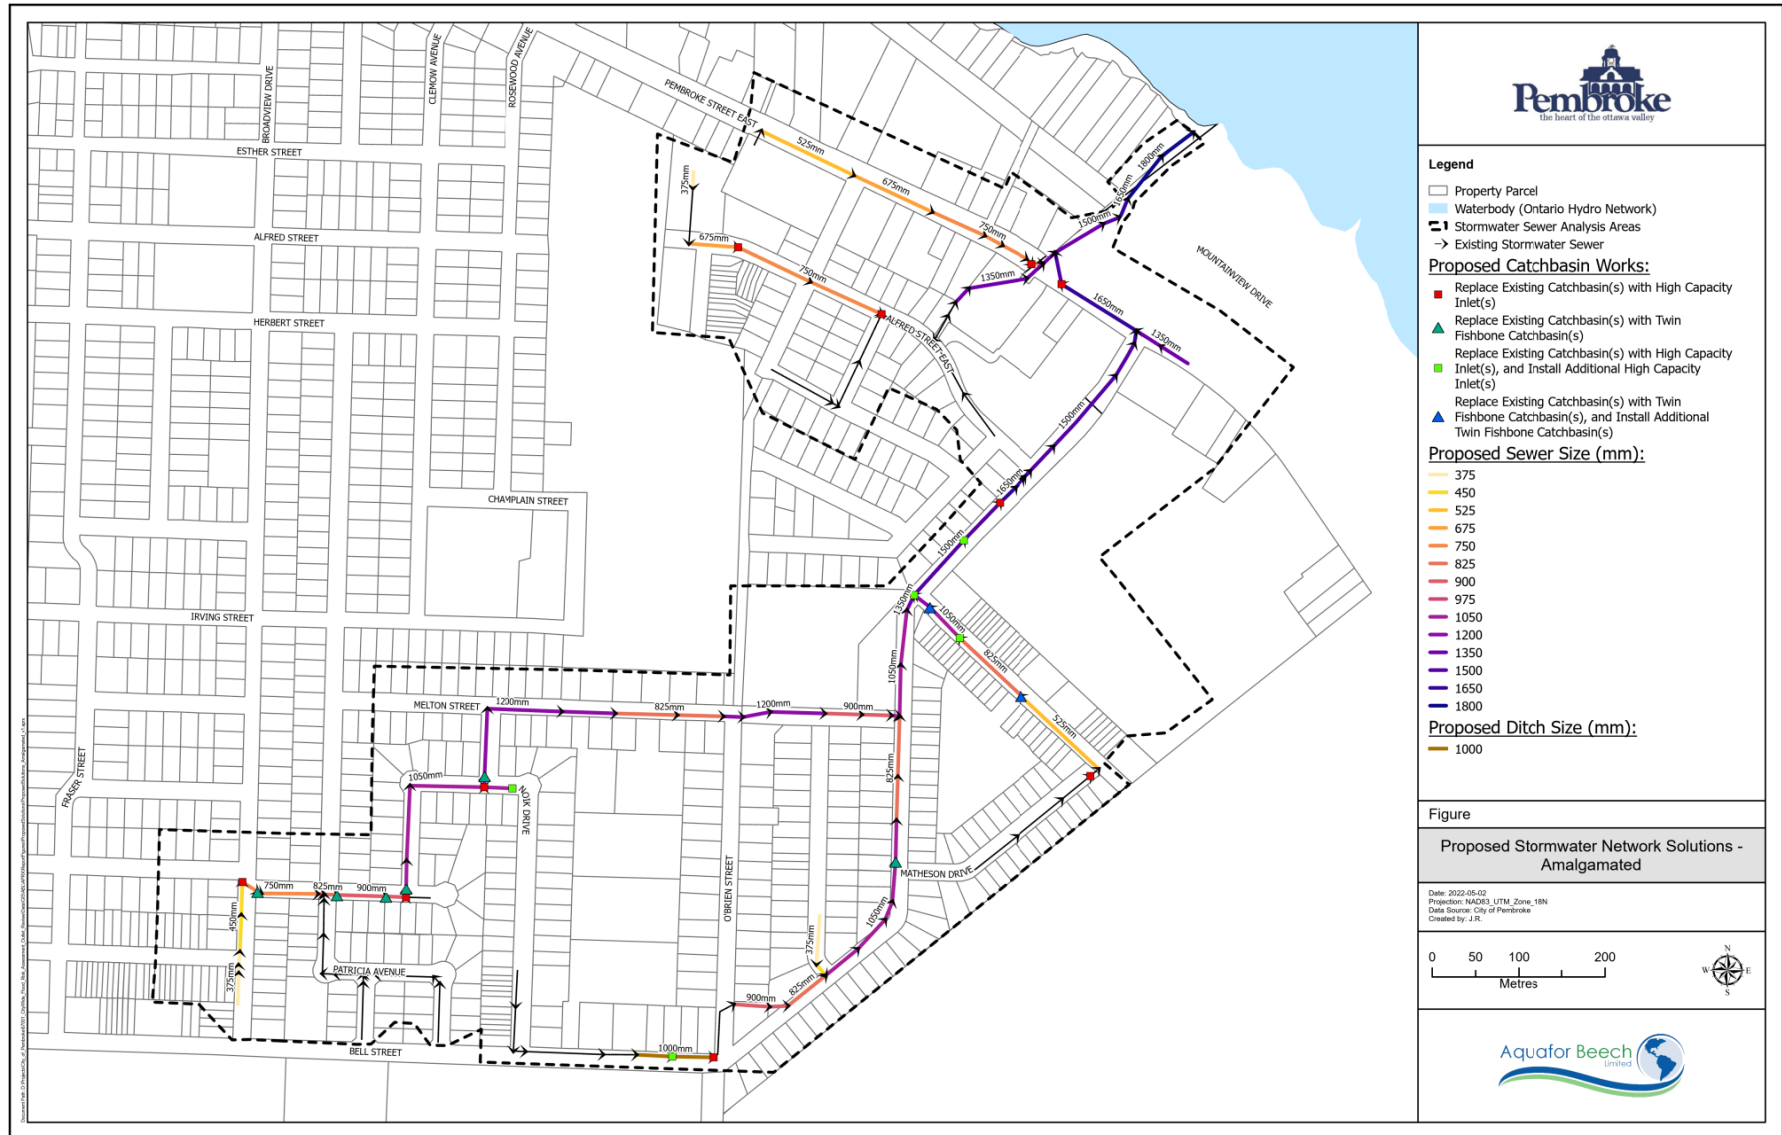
Proposed Stormwater Network Solutions of Amalgamated Area
